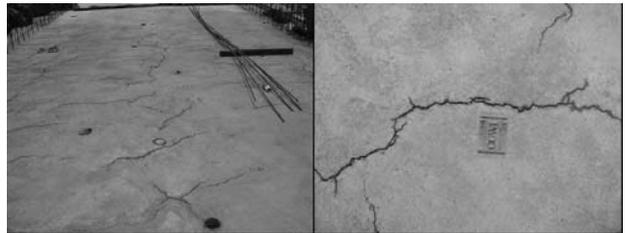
Plastic shrinkage cracks on bridge deck.
